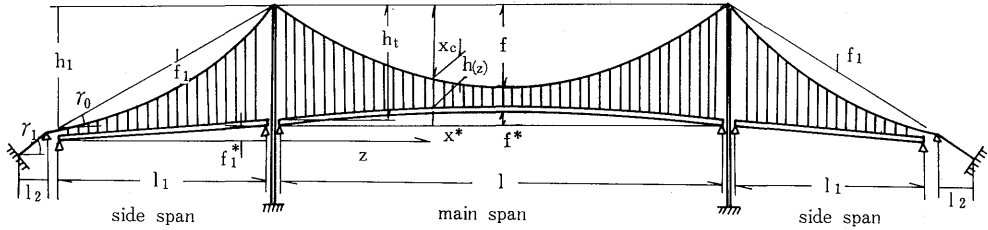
Geometry of a symmetrical three-span suspension bridge with simply supported stiffened girder
